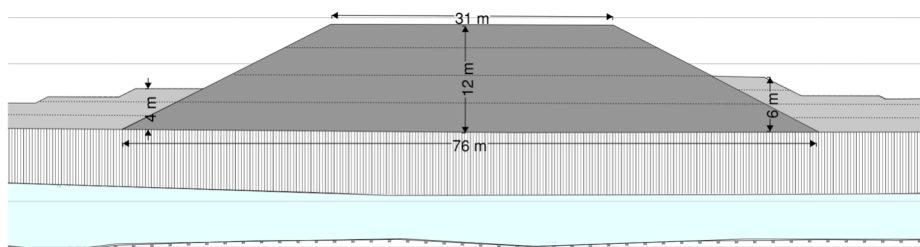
Typical cross section of the railway embankment over Tälleslätten. Height of the embankment is without surcharge.
